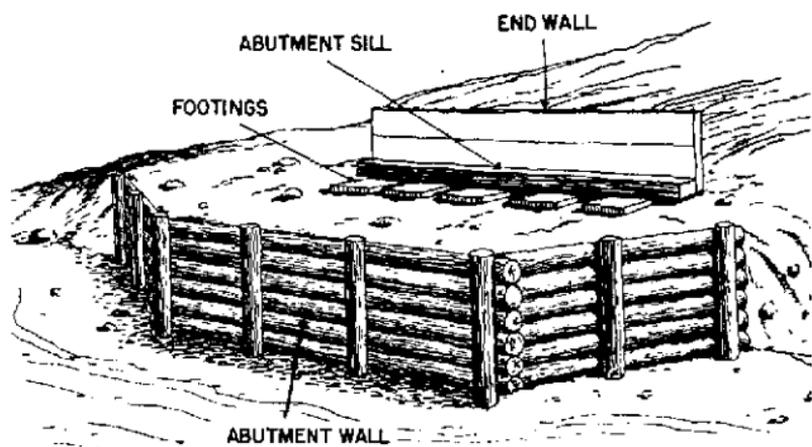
Typical earth abutment, with timber abutment sill and end wall.
